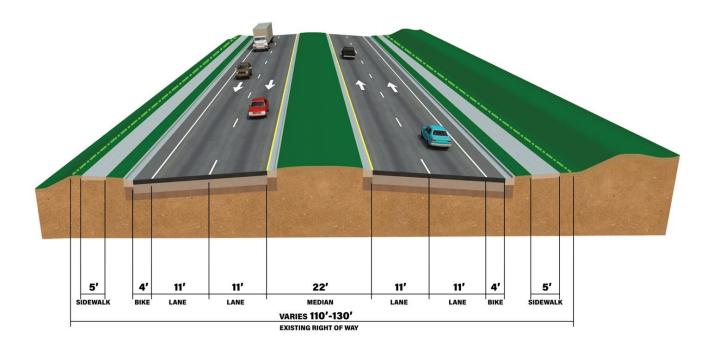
Existing Typical Section – East Lake Mary Boulevard
